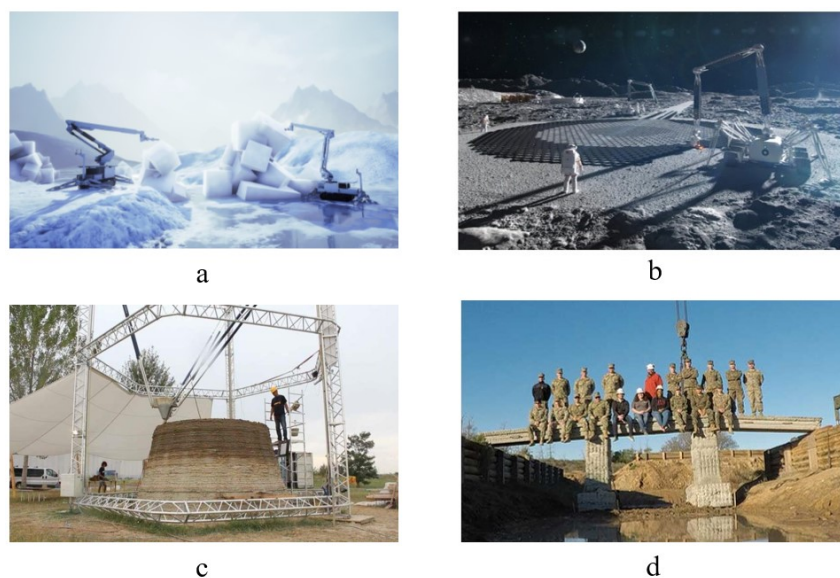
Examples of large-scale mobile 3D printing in a remote location: a) printing at polar areas [43], b) moon base printing [50], c) emergency shelter printing [48], and d) military bridge printing [49].
